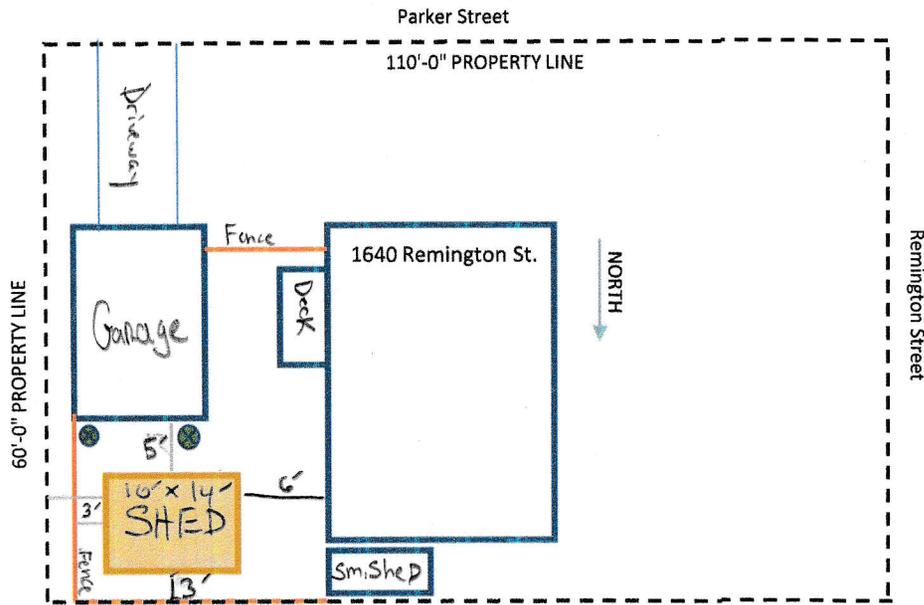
The proposed shed would face the back of our other neighbors' shed on its west side.
